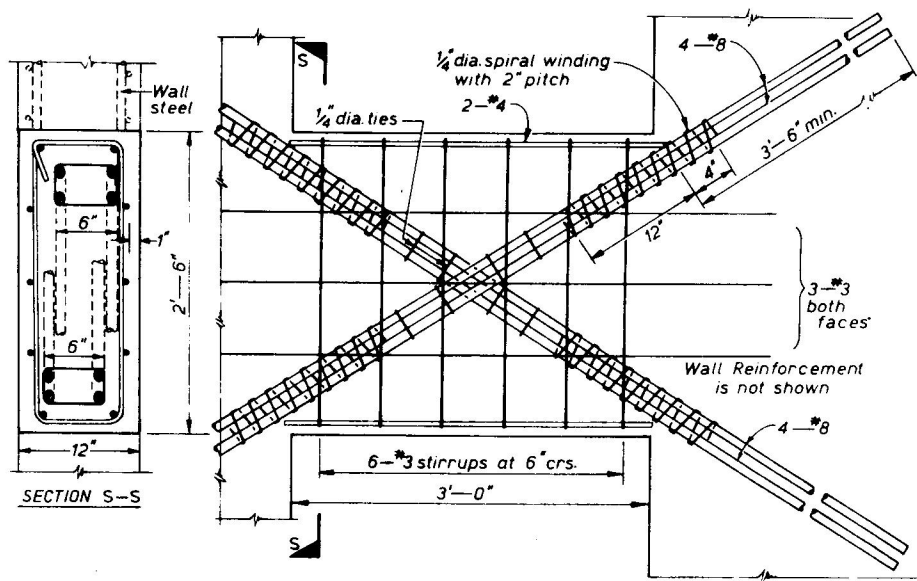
SUGGESTED STEEL ARRANGEMENT IN DIAGONALLY REINFORCED COUPLING BEAMS
